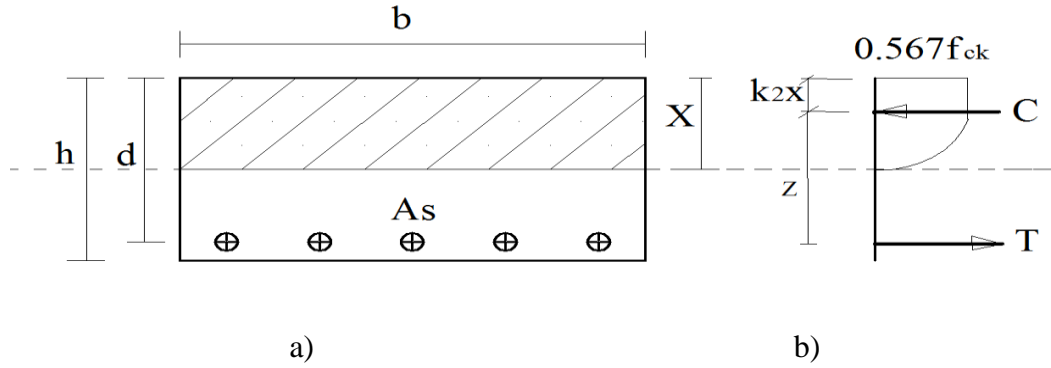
Singly reinforced section of shell, a) section, b) forces.
